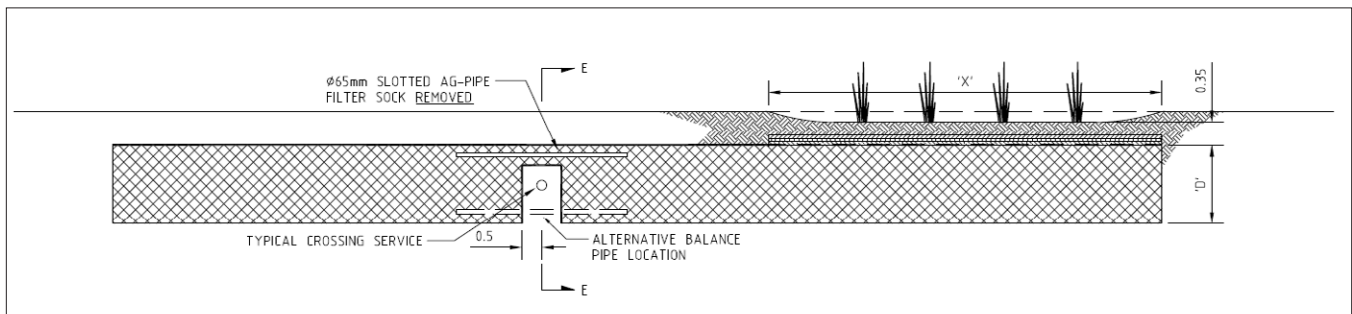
Example of innovative design to overcome interaction with services. In this example, the bioinfiltration system is constructed either side of a sewer line, with a connecting pipe in between, avoiding excavation underneath and surrounding the sewer.
